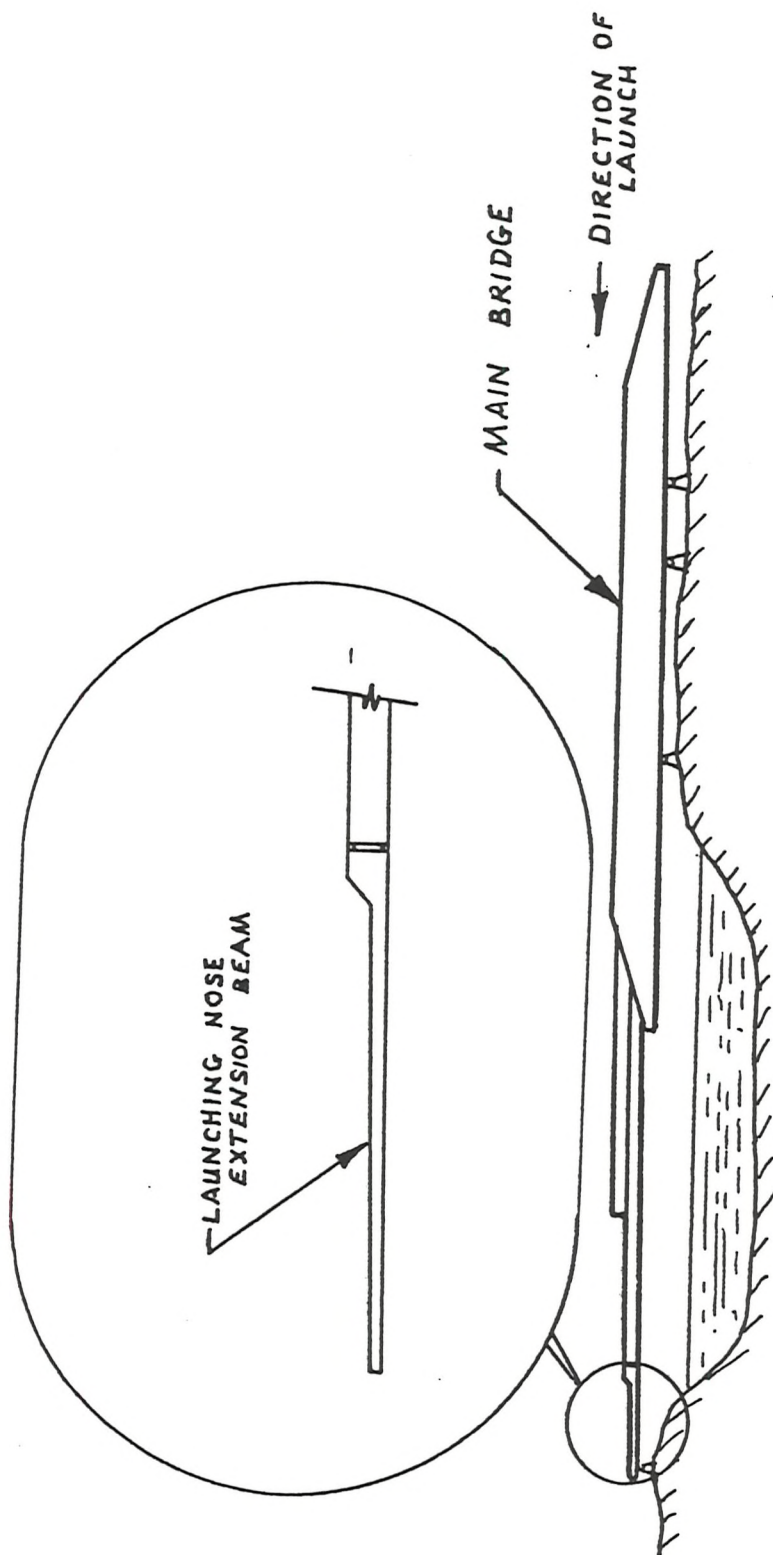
BRIDGE LAUNCHING PROBLEM
